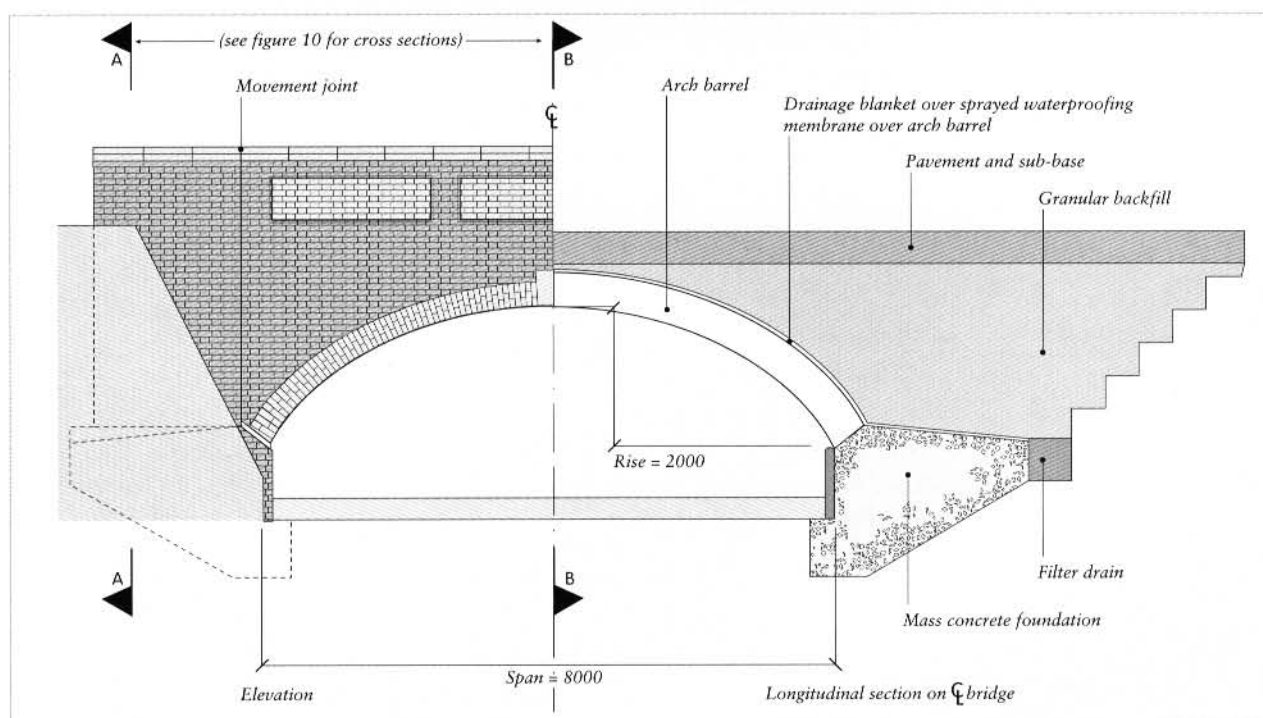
Elevation and longitudinal section of Kimbolton Butts Bridge.
